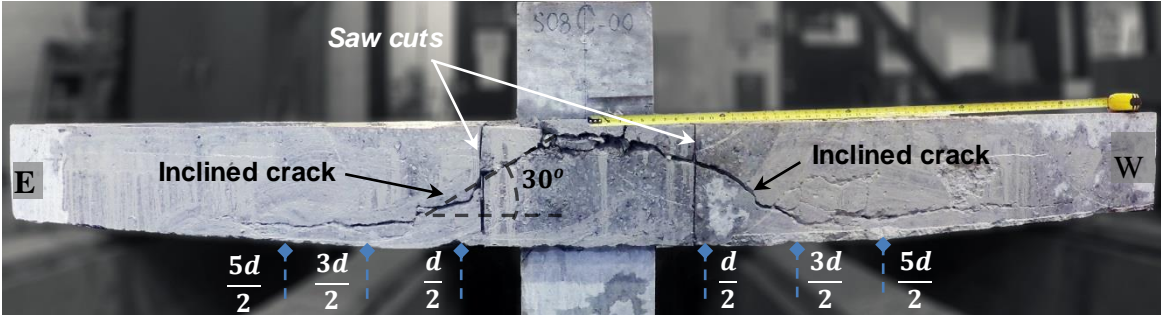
Cracks on a cut section close to the north face of the column for Specimen S08C (The cut location is shown in Fig. B-1)
